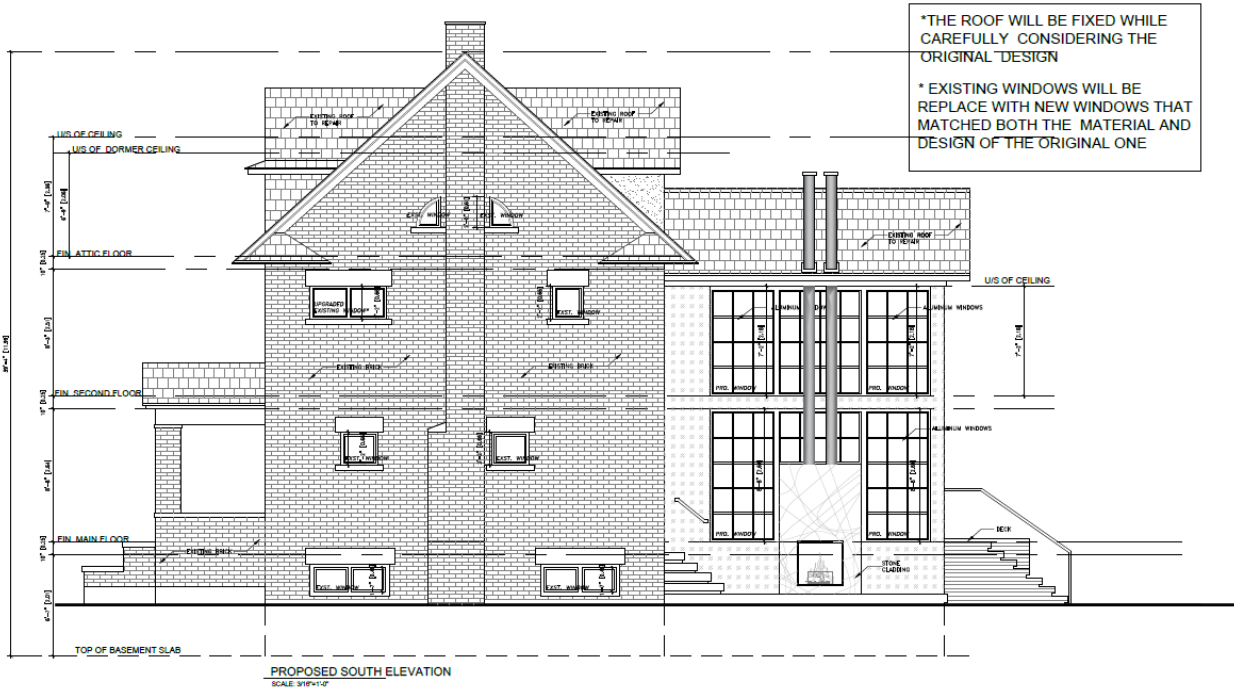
Architectural Drawing of Proposed South Facade Alterations
